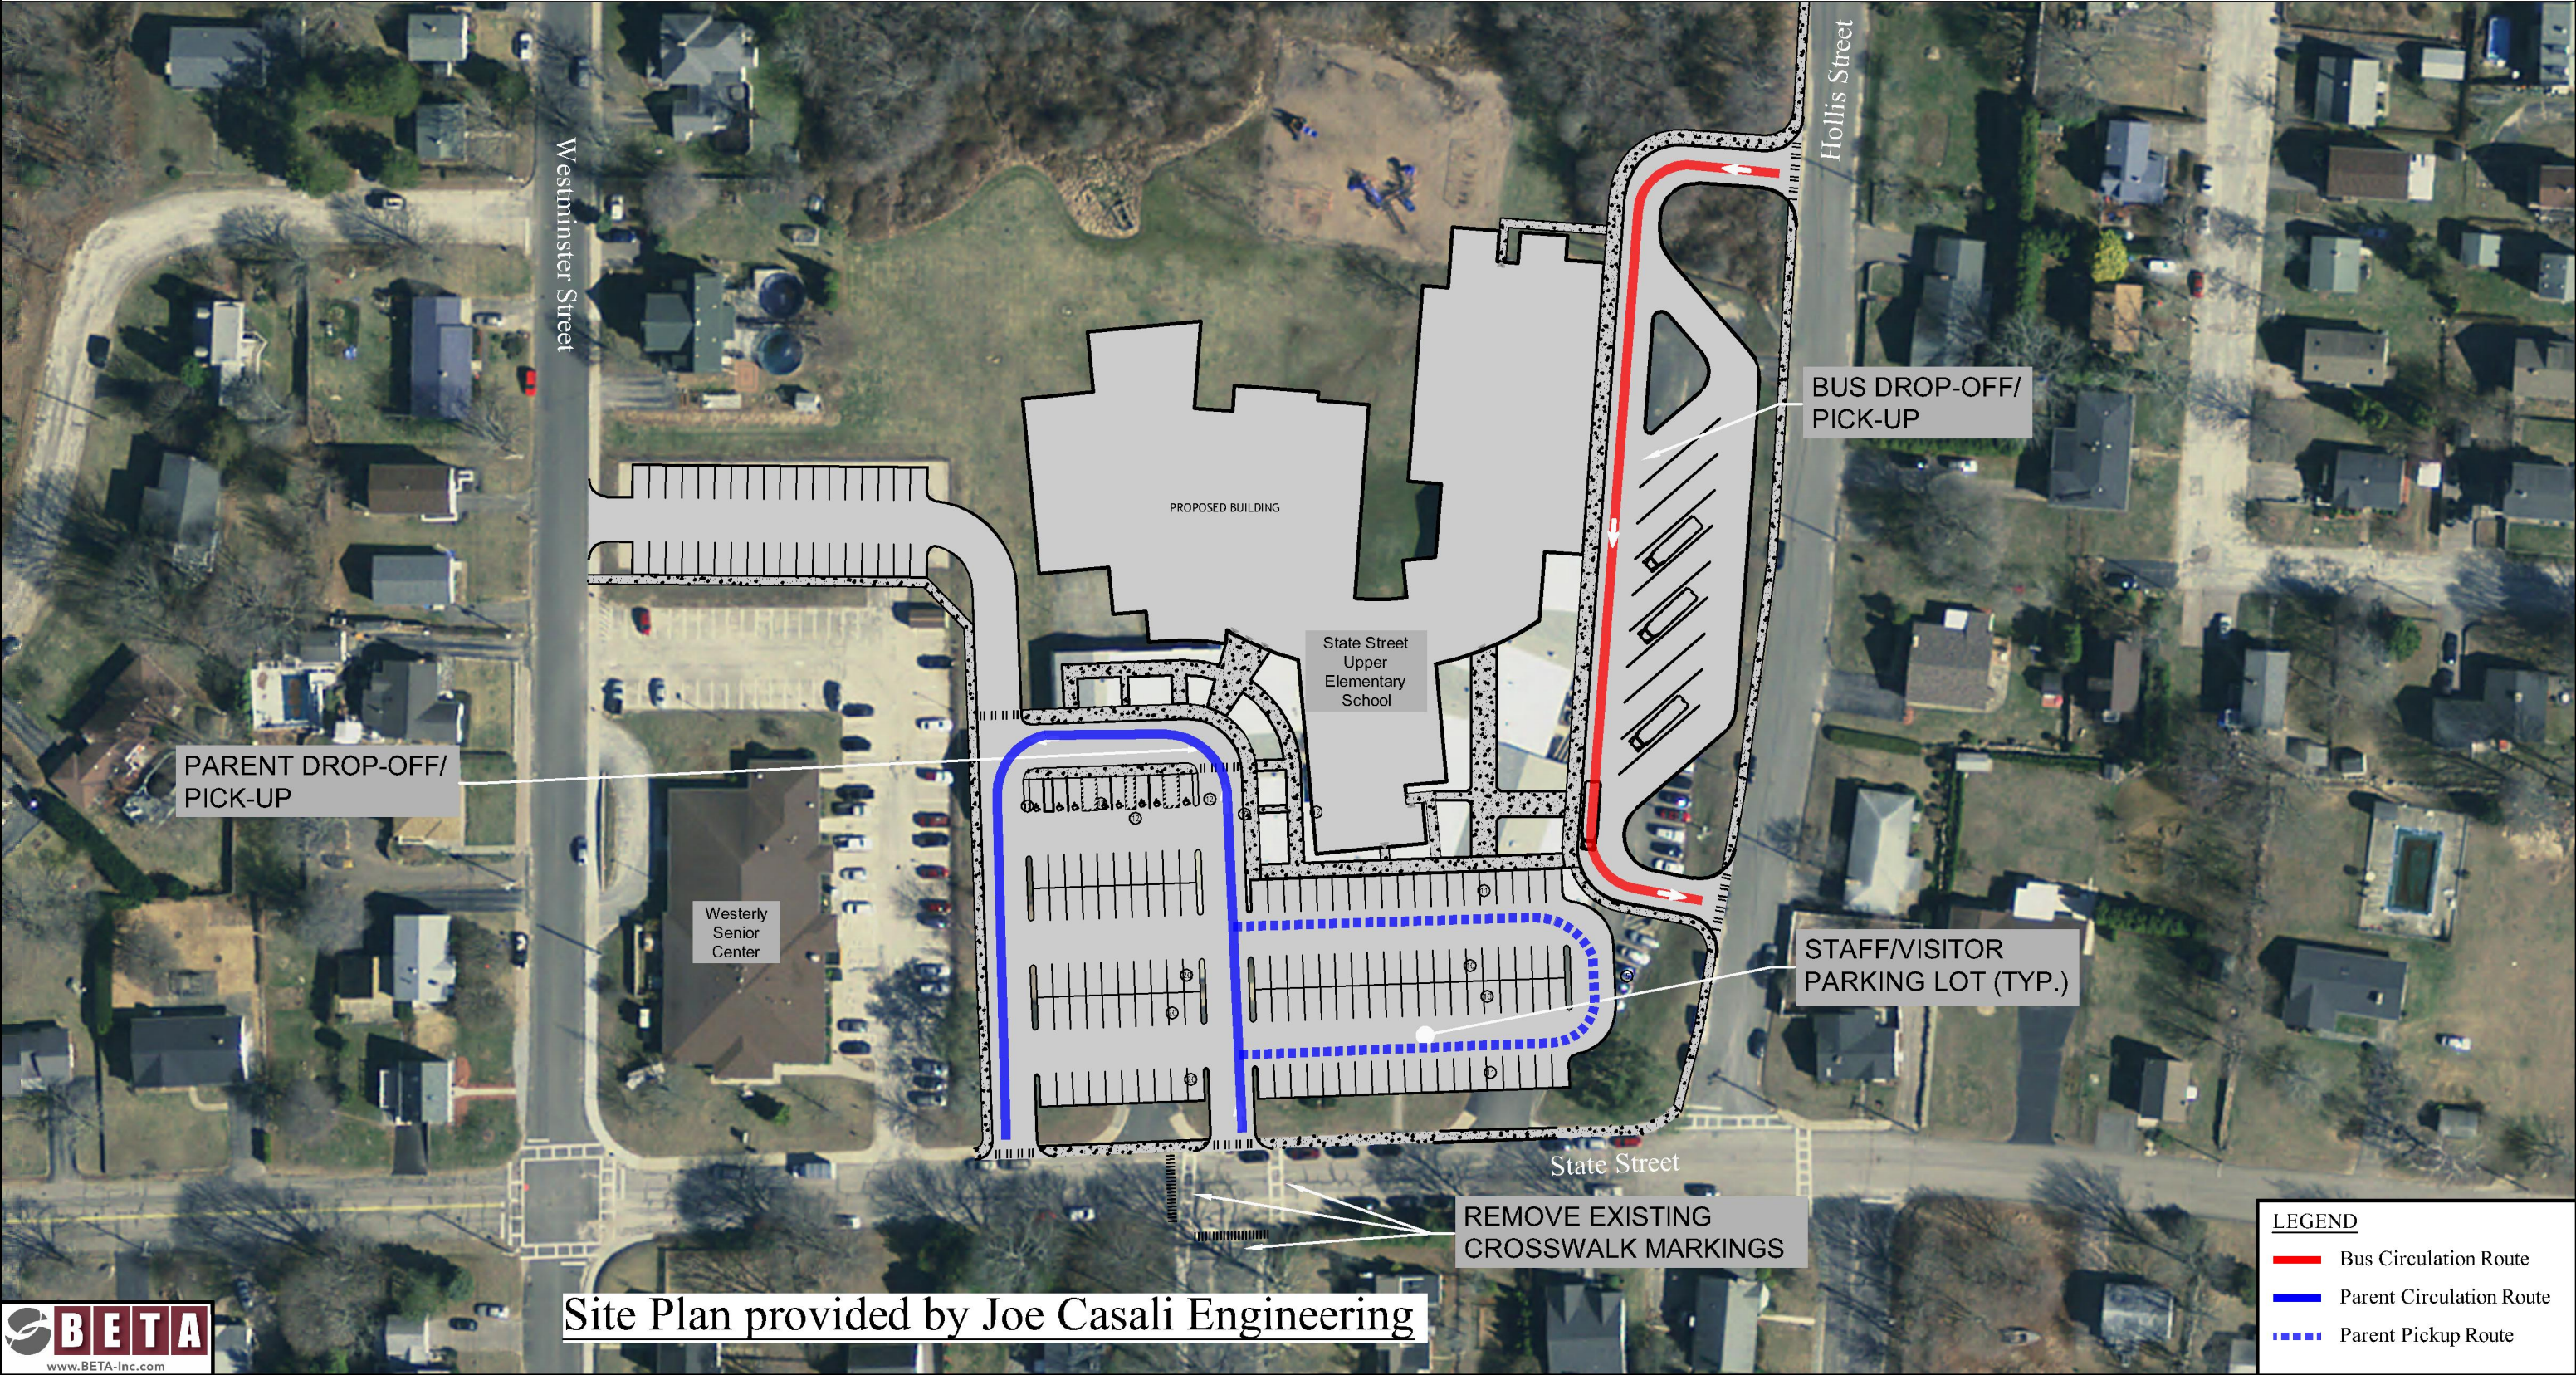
State Street Elementary School Proposed Access and Circulation - Alternative 1
